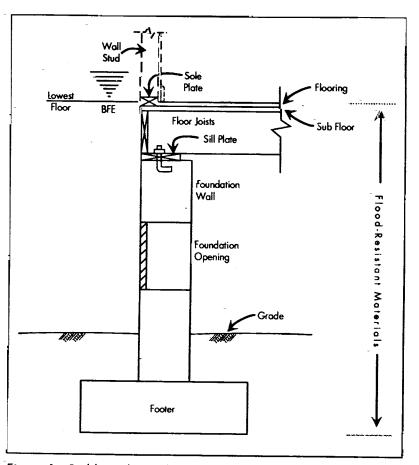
Building Elevated on Solid Foundation Walls Meeting the Minimum NFIP Requirements for Zones A, AE, A1–A30, AR, A0, and AH
